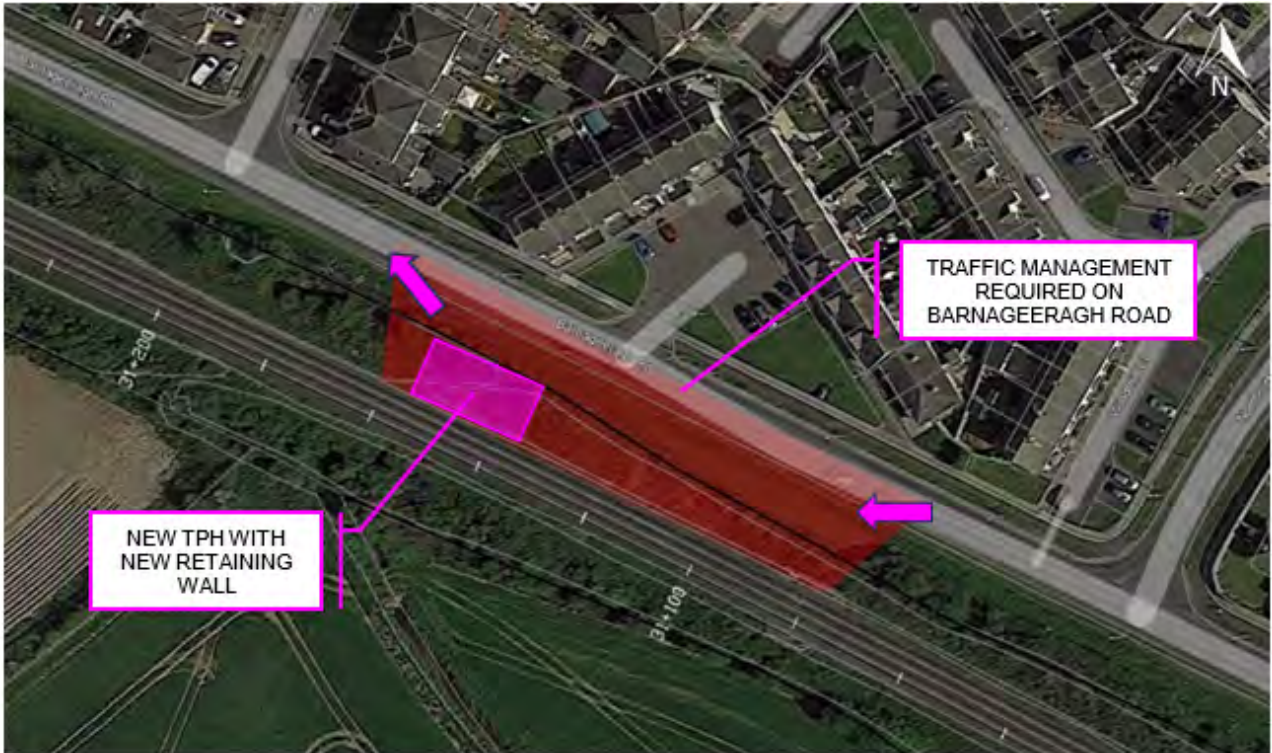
Skerries Track Paralleling Hut Construction Compound and Access Route
